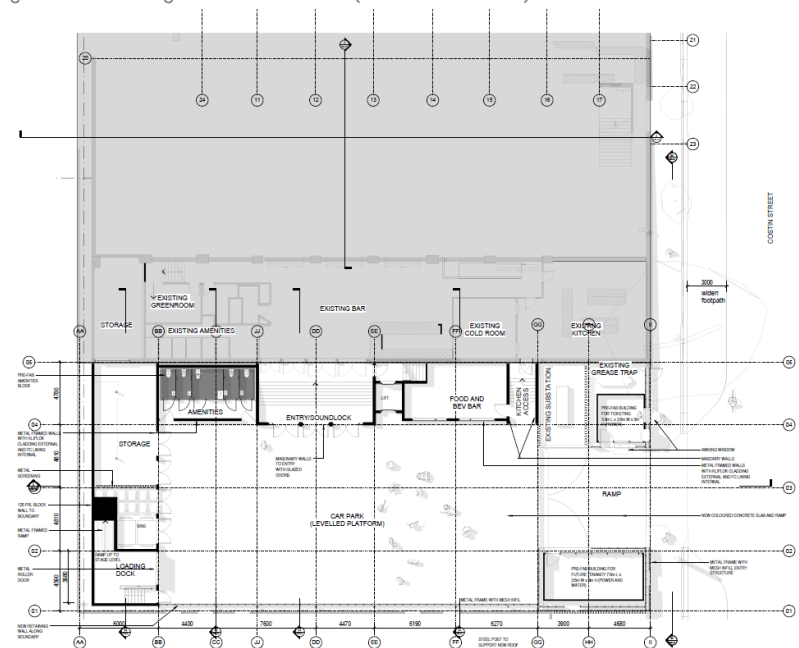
Proposed Carpark Floor Plan (Source: JDA Co.) – refer attached PDF for full drawing
